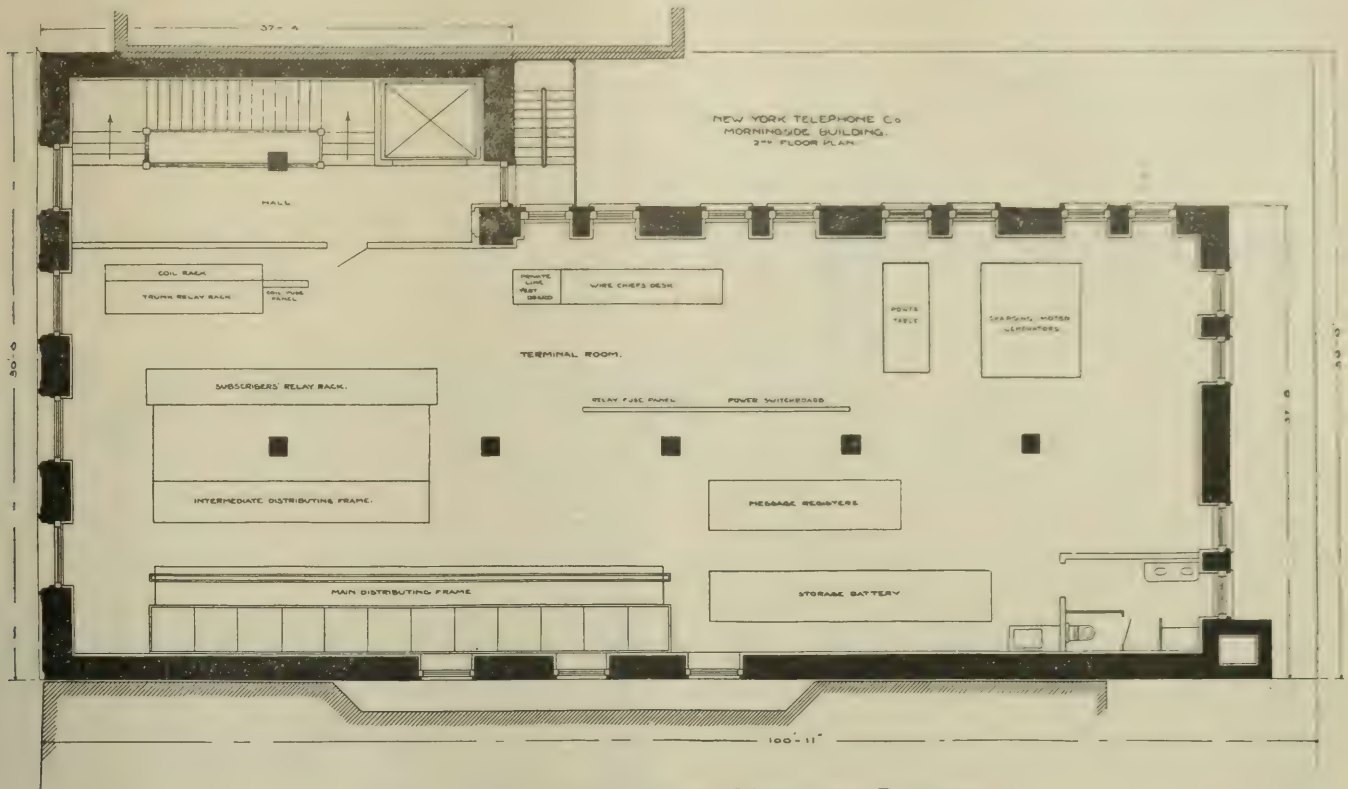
PLAN OF SECOND FLOOR, MORNINGSIDE BUILDING.
